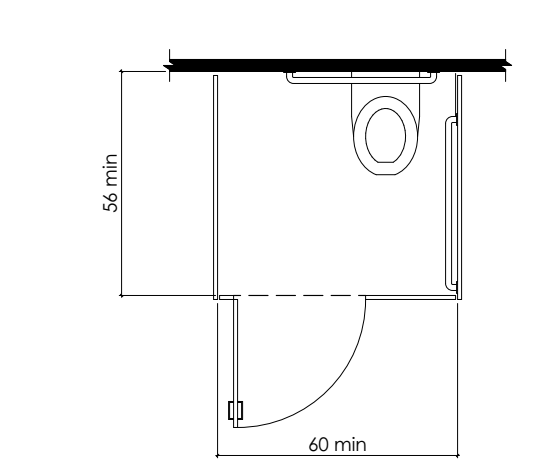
Size of Wheelchair Accessible Toilet Compartment
